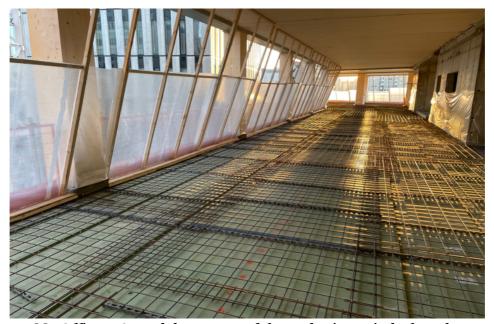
Office 2 CLT-slabs protected from sloping rain before the surface concrete casting.
